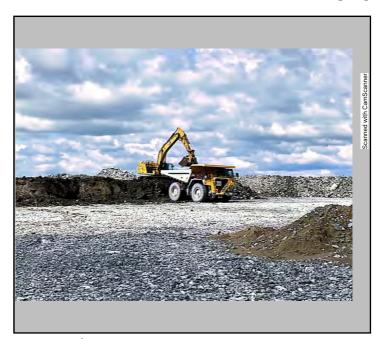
Excavator 836 loading Trucks with clay material at the North Stock pile.
